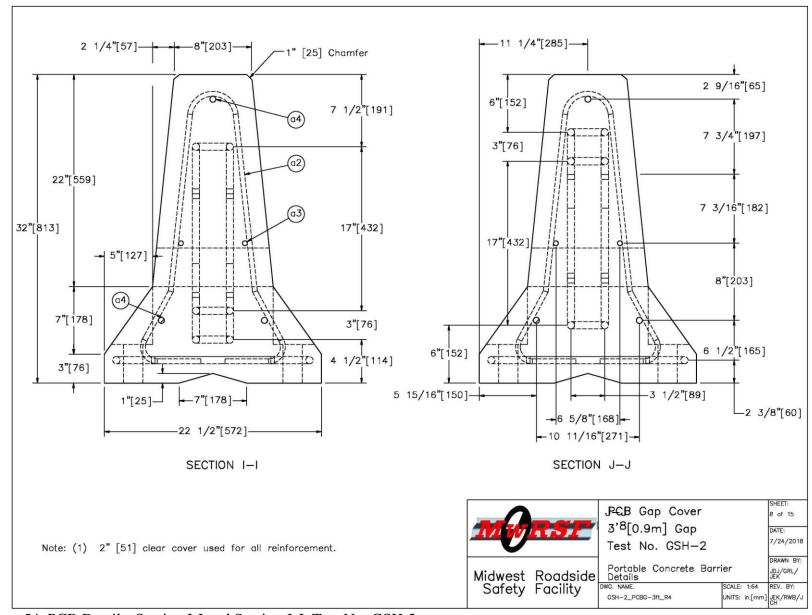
PCB Details, Section I-I and Section J-J, Test No. GSH-2
